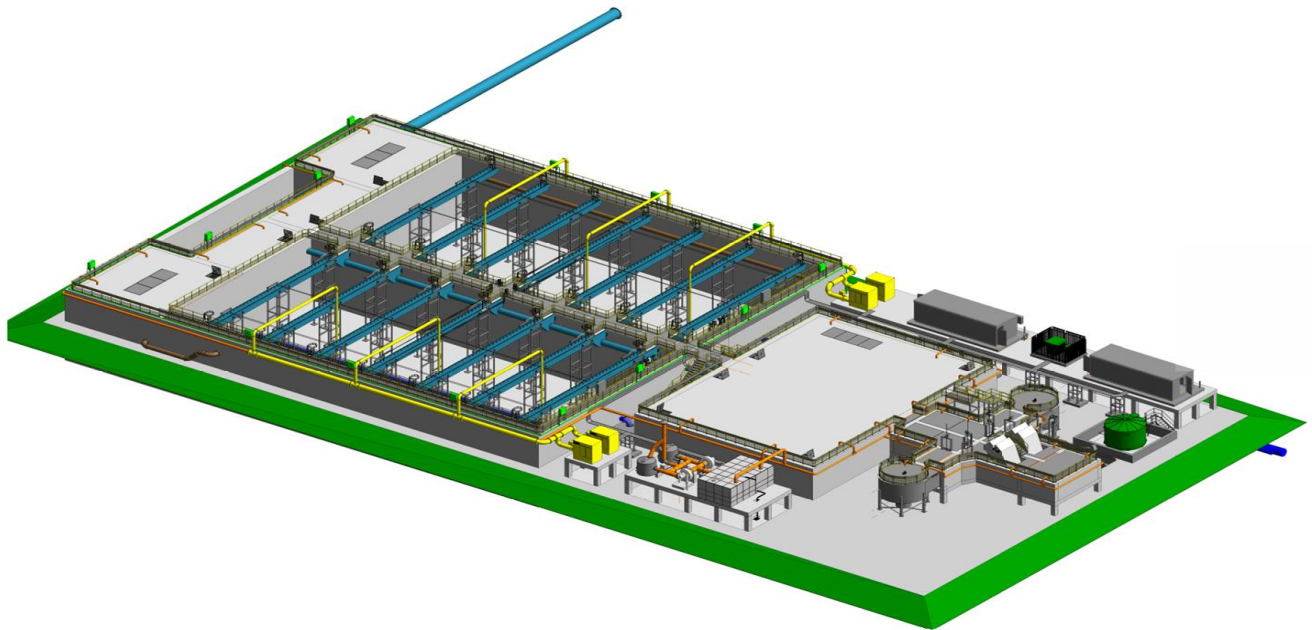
PROPOSED NEW INLET WORKS & AGS TANK 3D VIEW
